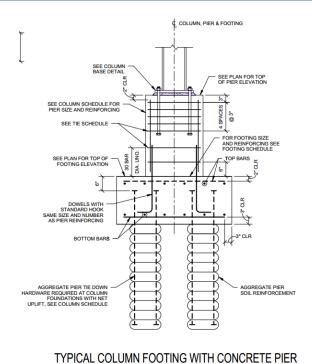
TYPICAL COLUMN FOOTING WITH CONCRETE PIER
